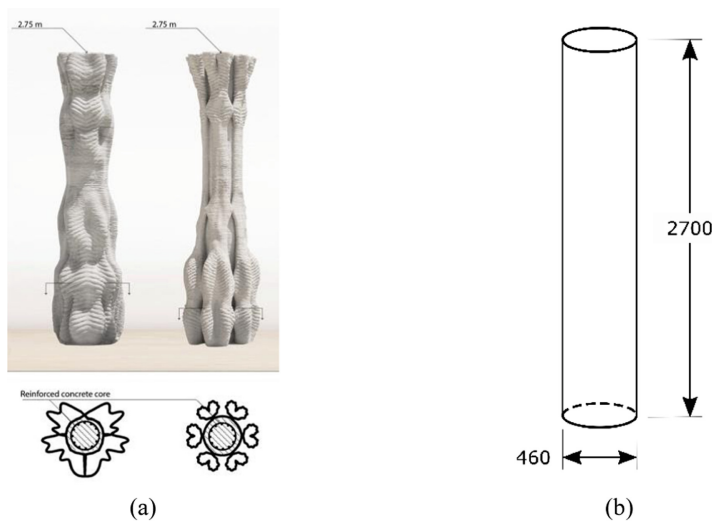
(a) Columns made for the Concrete Choreography project [57]. Image credit: Ana Anton, Digital Building Technologies; (b) Theoretical columns made using conventional construction and precast (units shown in mm)
